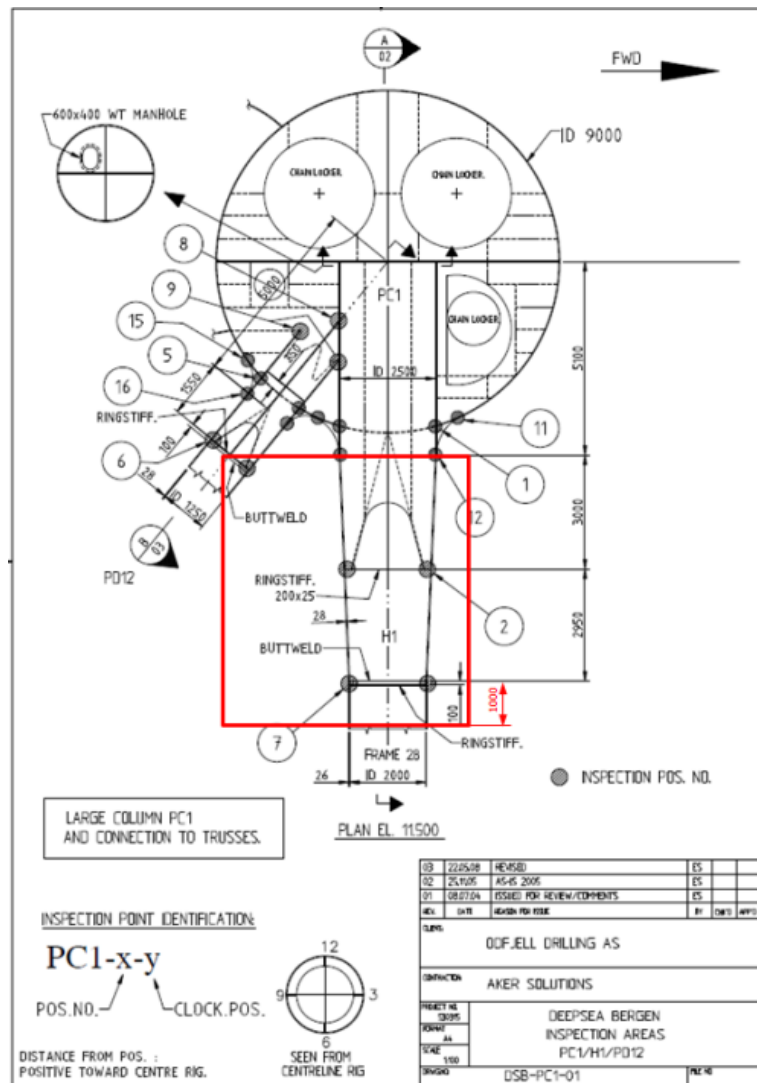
Model used for fatigue analysis, indicated on inspection drawing of column PC1 and brace H1.
